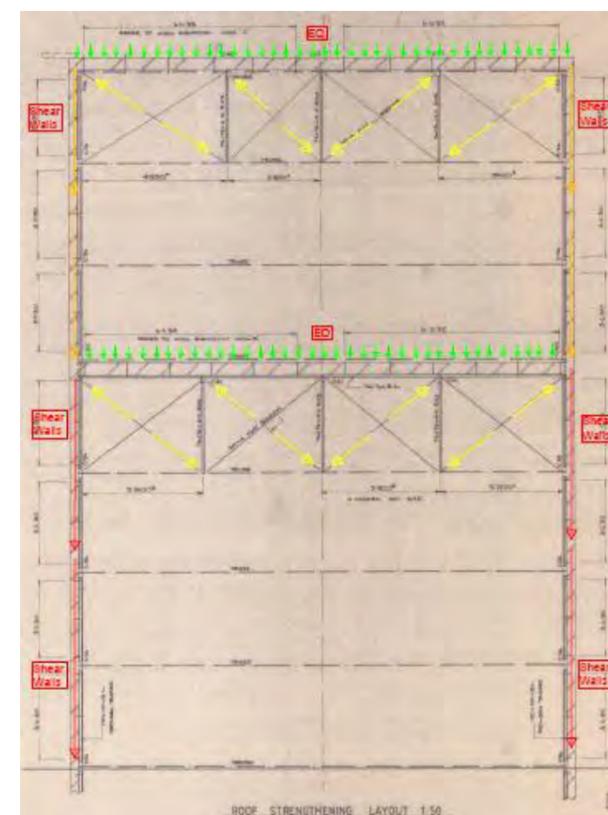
Southland Times rear element roof bracing longitudinal lateral load path
